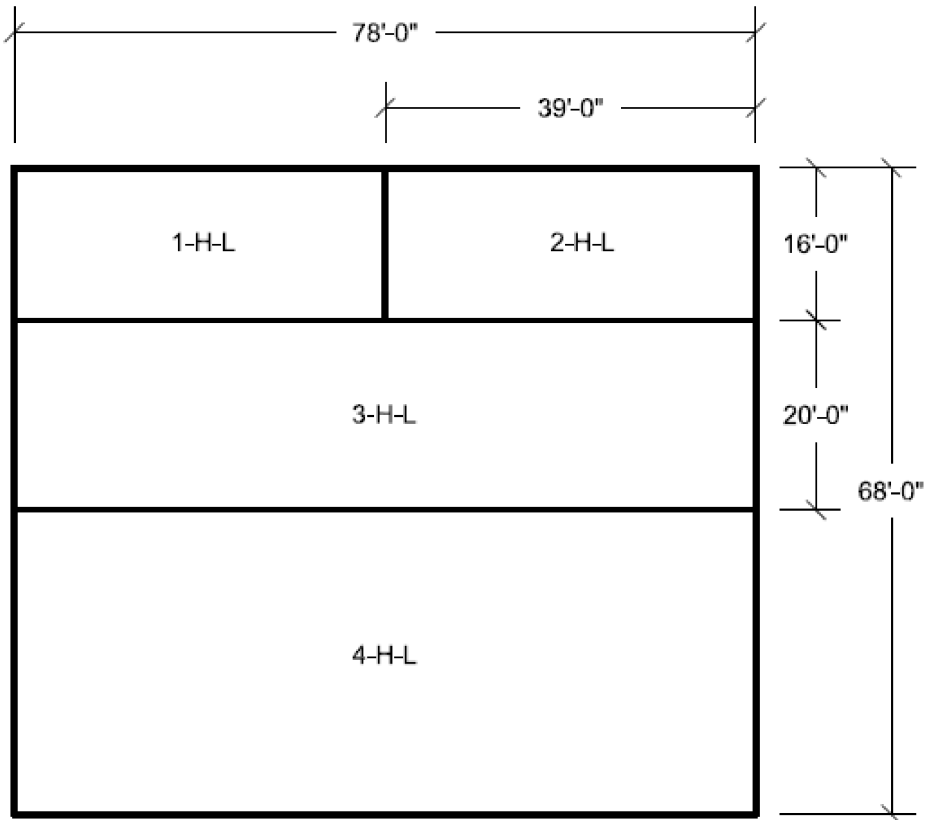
H.6-58 Pump House East Wall Looking West Horizontal Reinforcement Zones Far Side Face
